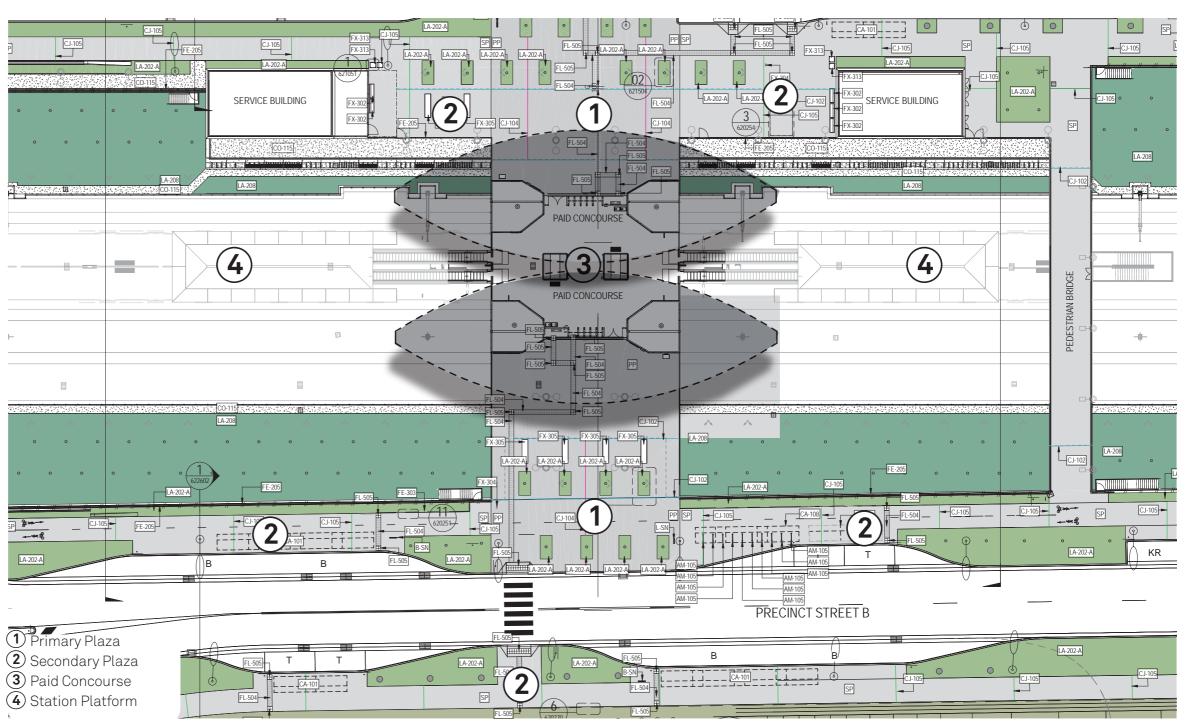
CUD\_Cudgegong Road Station Landscape Plaza Plan. Source: HASSELL.
